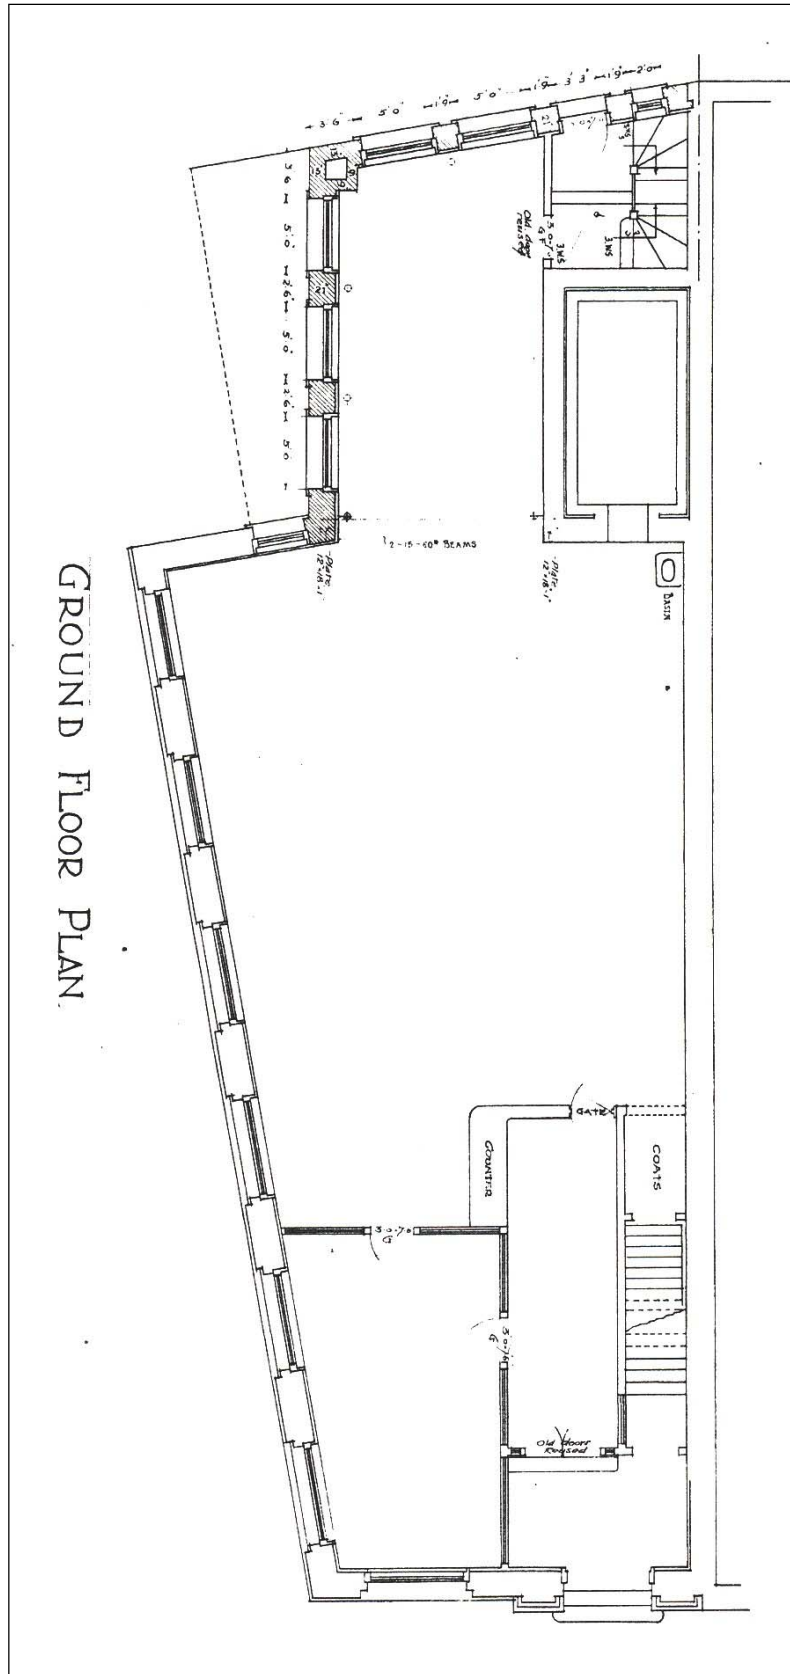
Architect’s Plans, “Ground Floor Plan,” 1911. The rear section now runs to the lot line and extends to the second floor. (Courtesy of the City of Winnipeg Archives, Plan #808/1911.)
